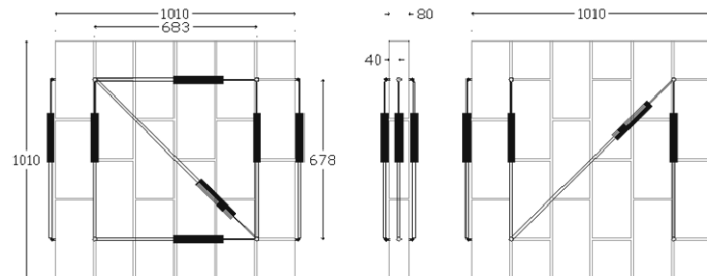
hollow brick panels layout of sensors on the wall compressed parallel to holes [mm]
